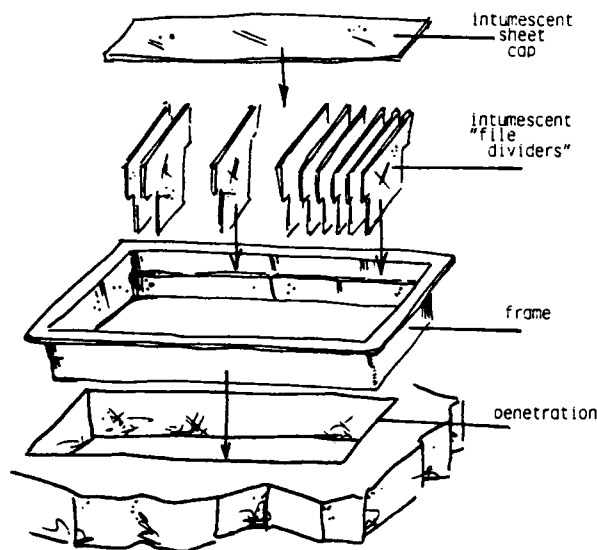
HANGING CARD RISER CABLE PENETRATION
